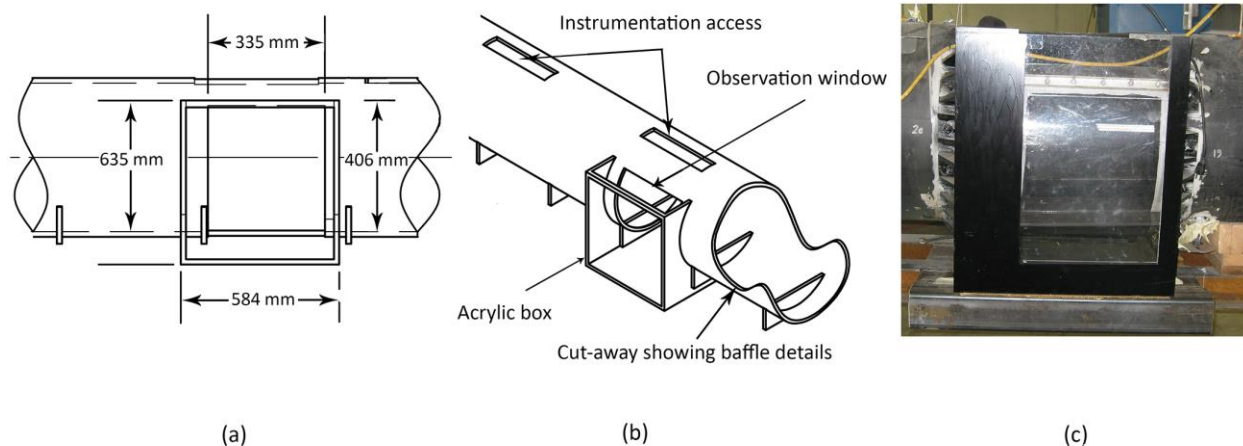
Overviews of baffled culvert observation ports and windows for fish viewing (a) elevation; (b) perspective; (c) photographic
